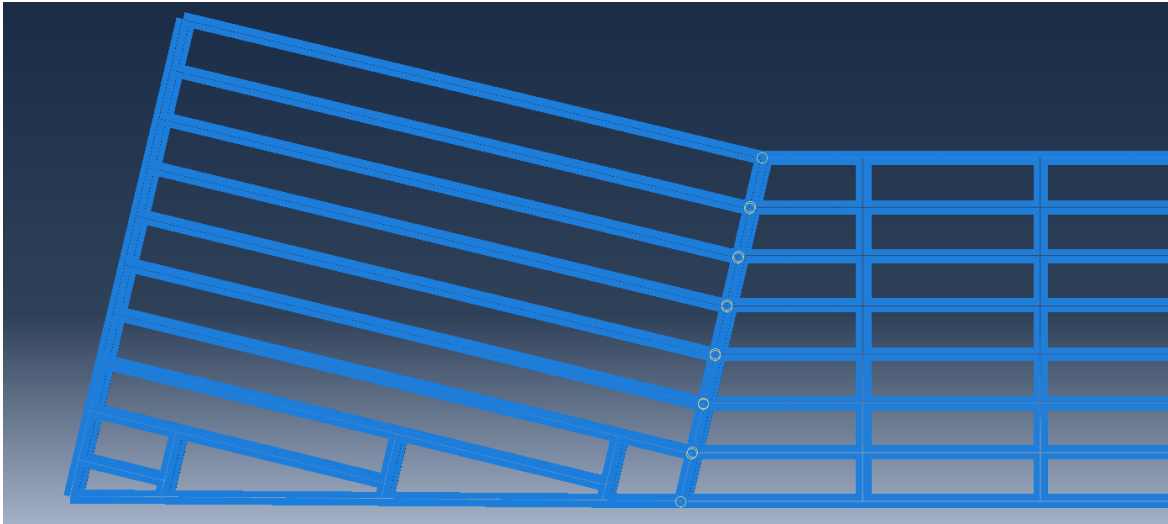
Overview of the floor beams consisting of HEA500 and HEA280 profiles.
